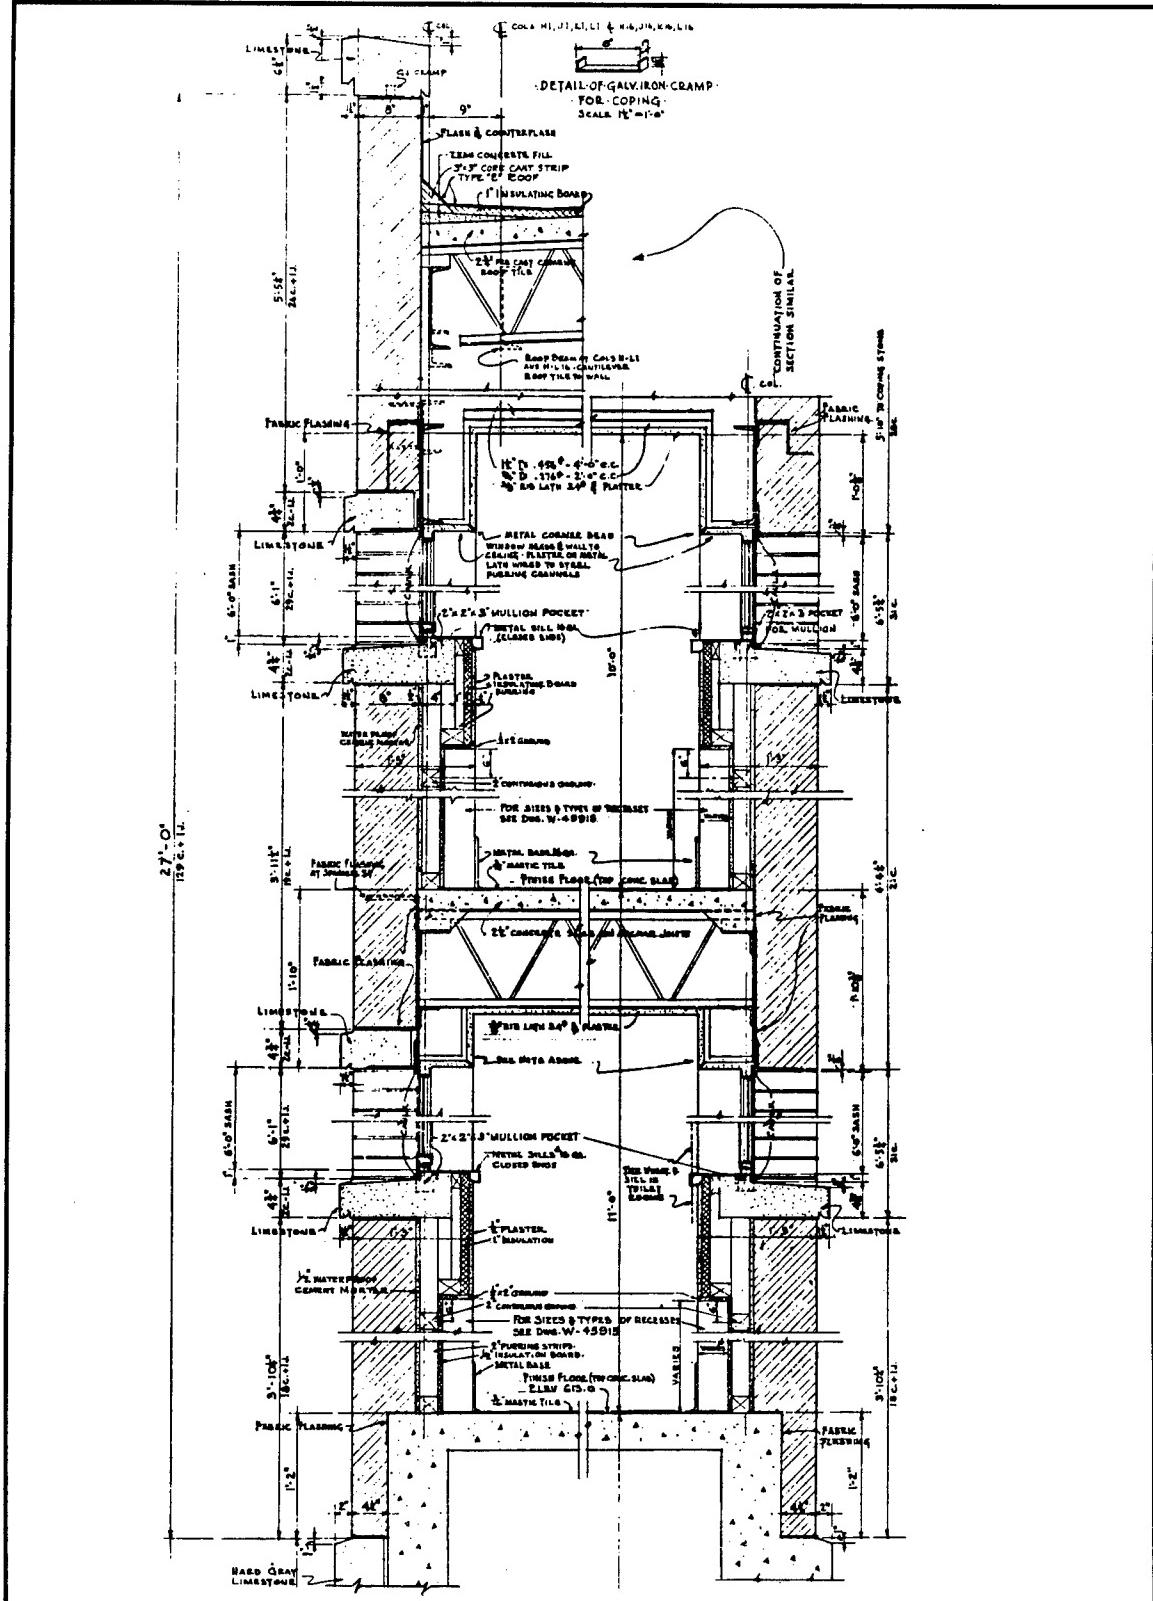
Typical wall section, Administration Building (Building 703), Indiana Ordnance Works Plant 1 (INAAP Drawing W-45918).
